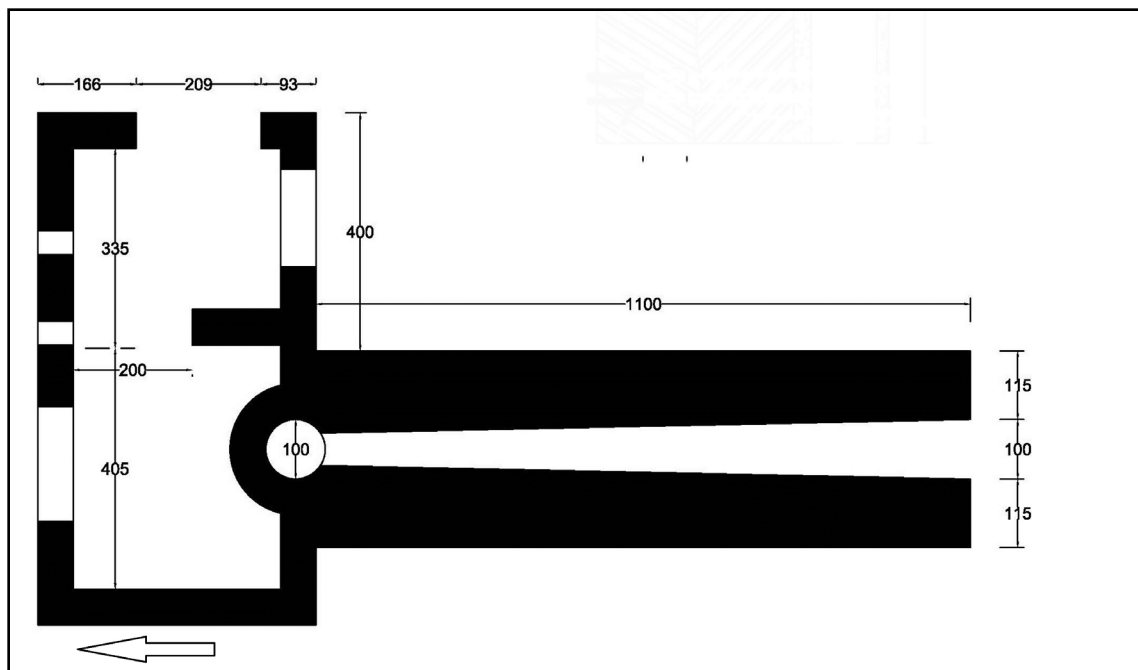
Plan of Sheikh Makan Building (Author, 2024).
